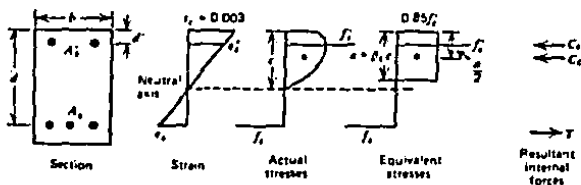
Doubly reinforced concrete section when the flexural strength is reached.
